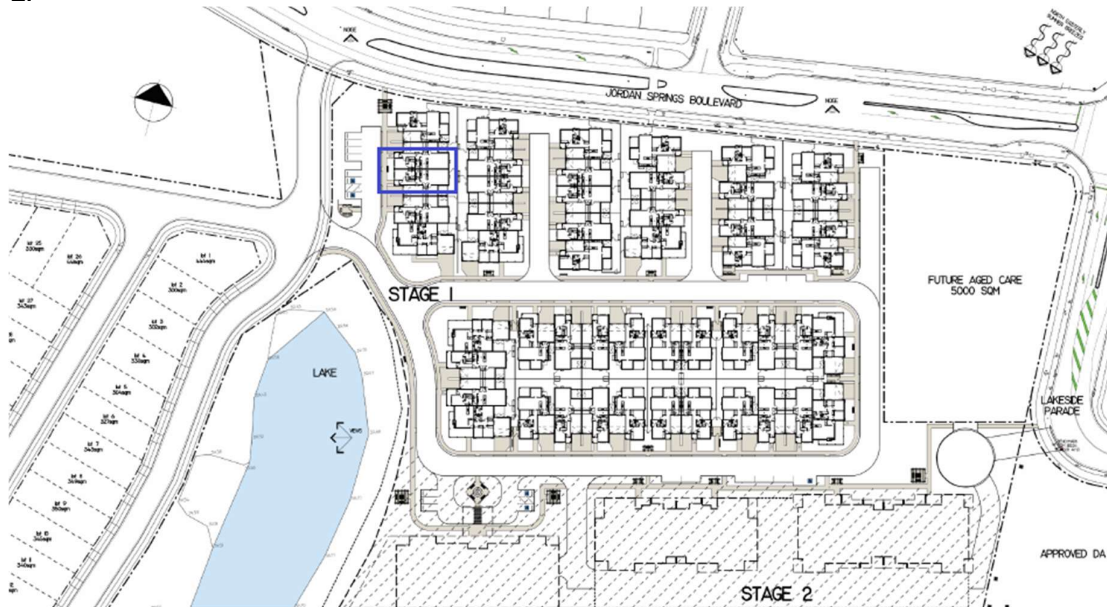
DA18/0678 Approved Site Plan - Villa 2 outlined in blue (Base Source: PCC)
